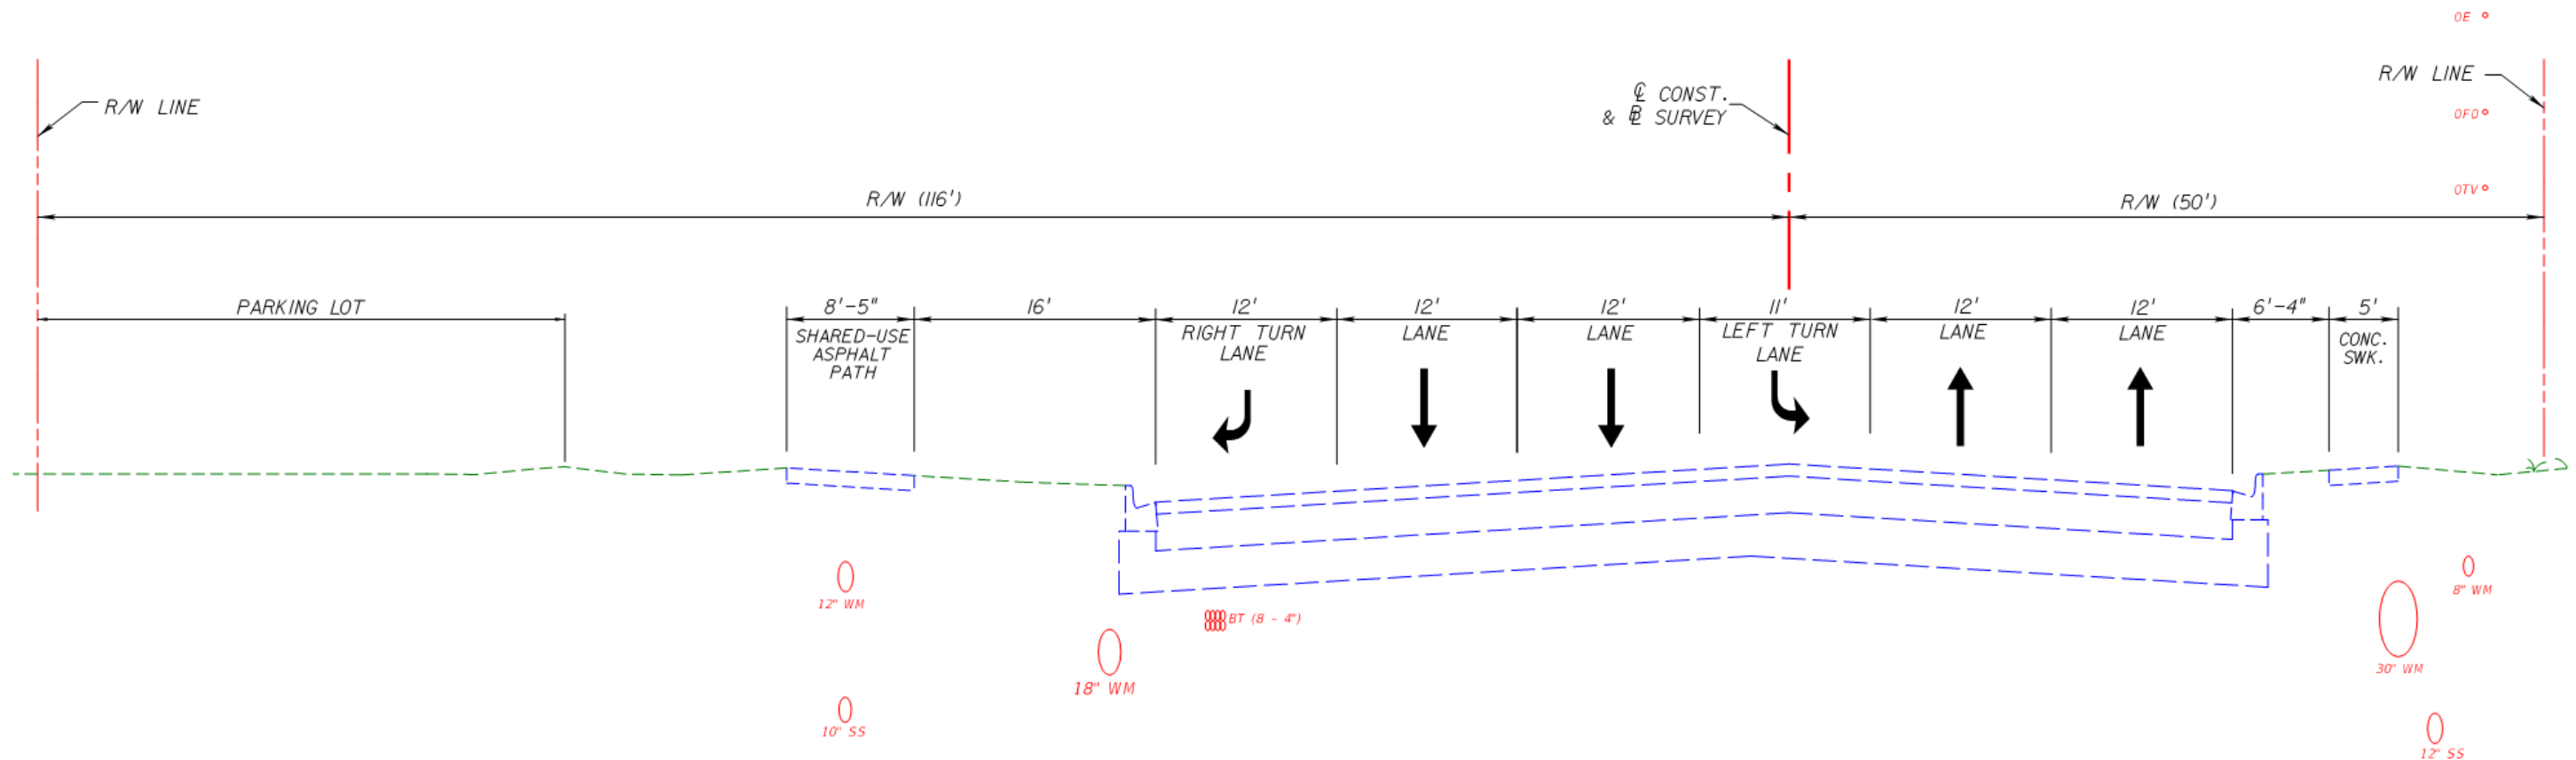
Location 2C (MM ±49.2) Existing Conditions Plan
